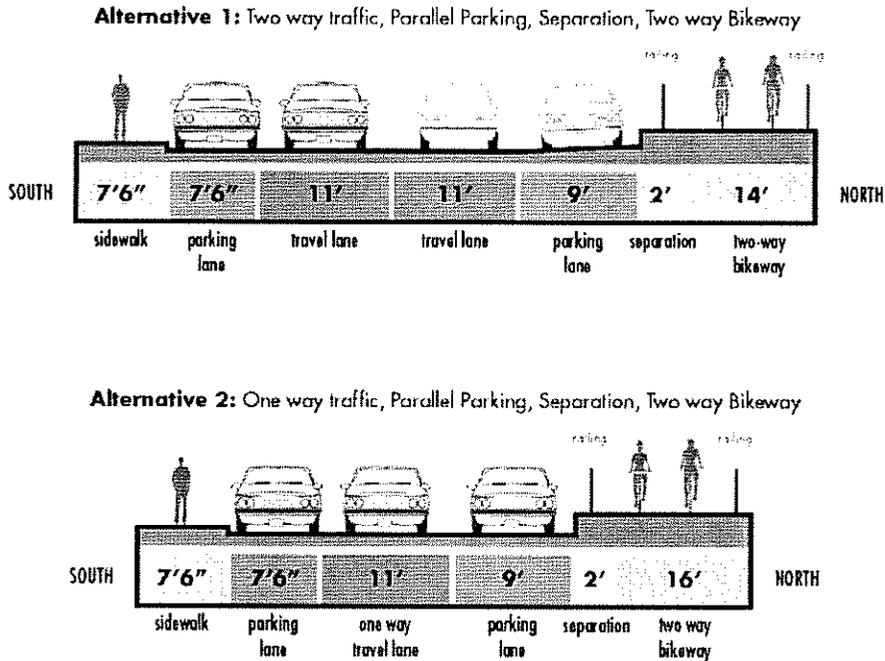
Section of Proposed Improvements for Project 10: Greenfield Avenue (Lincoln Park to Spring Grove Avenue) (Short-Term Improvements)
